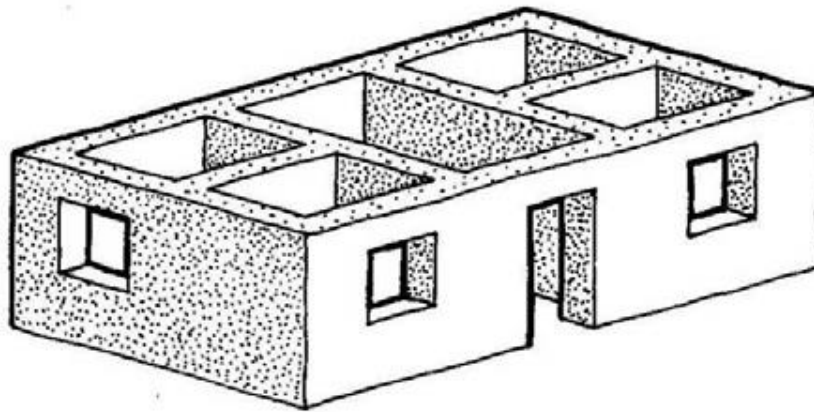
Compact box-type layout (Blondet, Villa Garcia, Brzev, & Rubiños, 2011)
